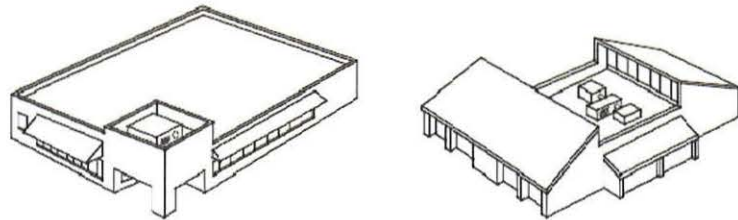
Examples of how to screen roof-mounted mechanical equipment.
